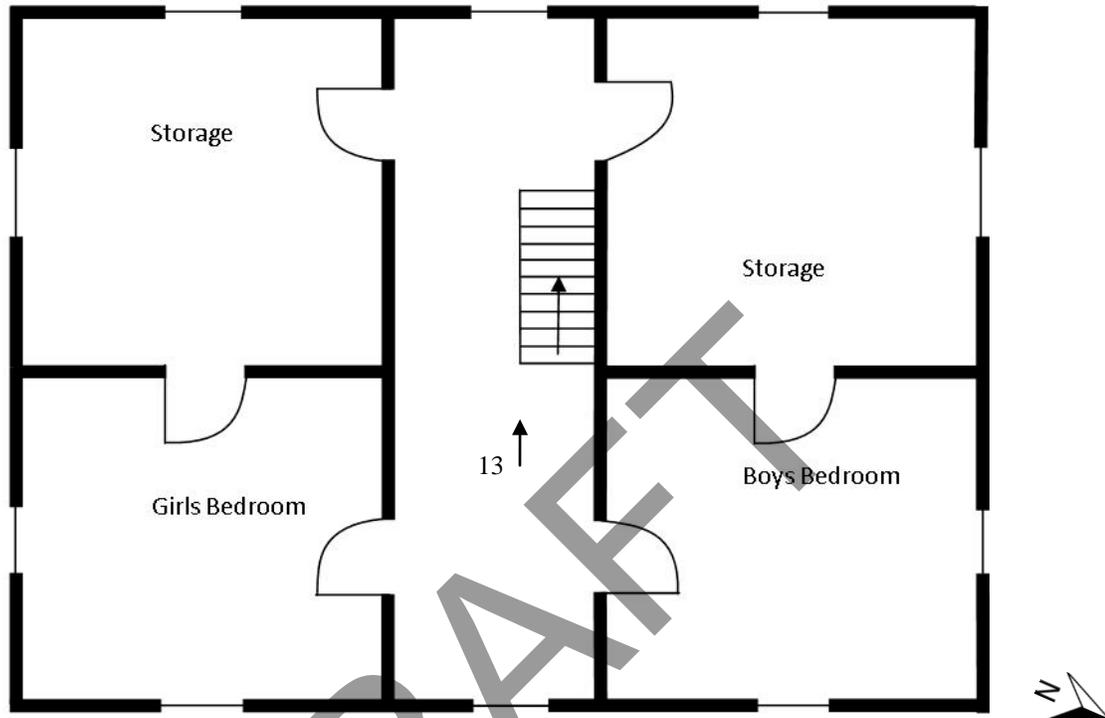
Second floorplan sketch of the farmhouse with photo 13 notation, 2015. Not to scale.
